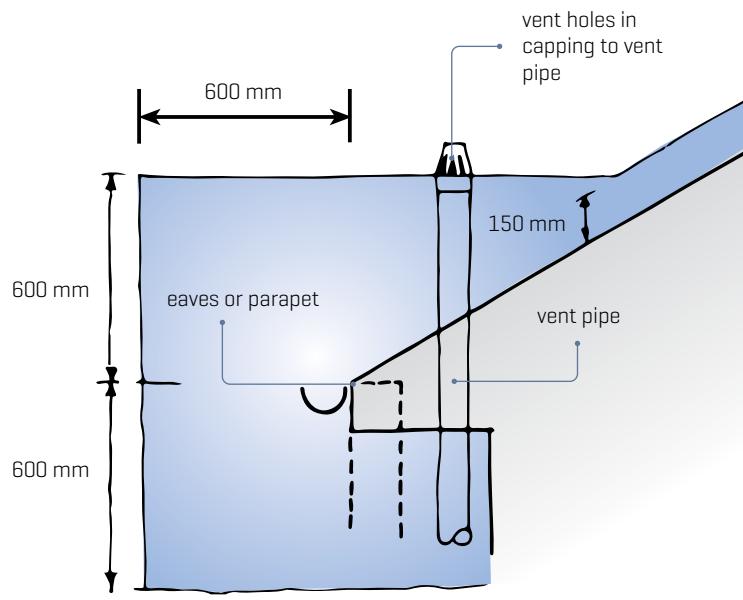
Termination point of vent 600 mm above an eave or parapet, 150 mm above roof.
